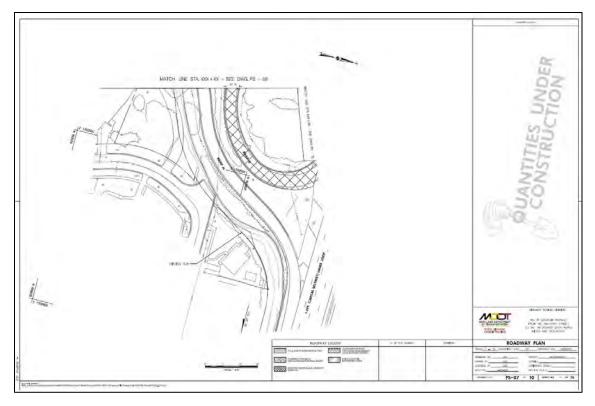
Plan View – I-495 Inner Loop On-Ramp
